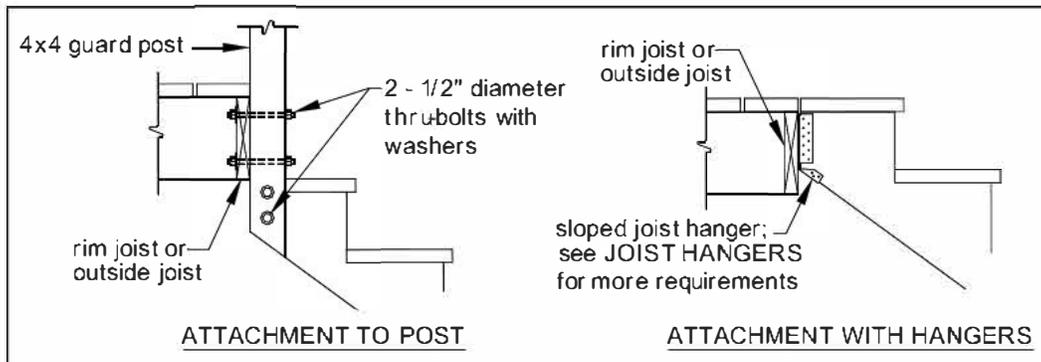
STAIR STRINGER ATTACHMENT DETAIL
